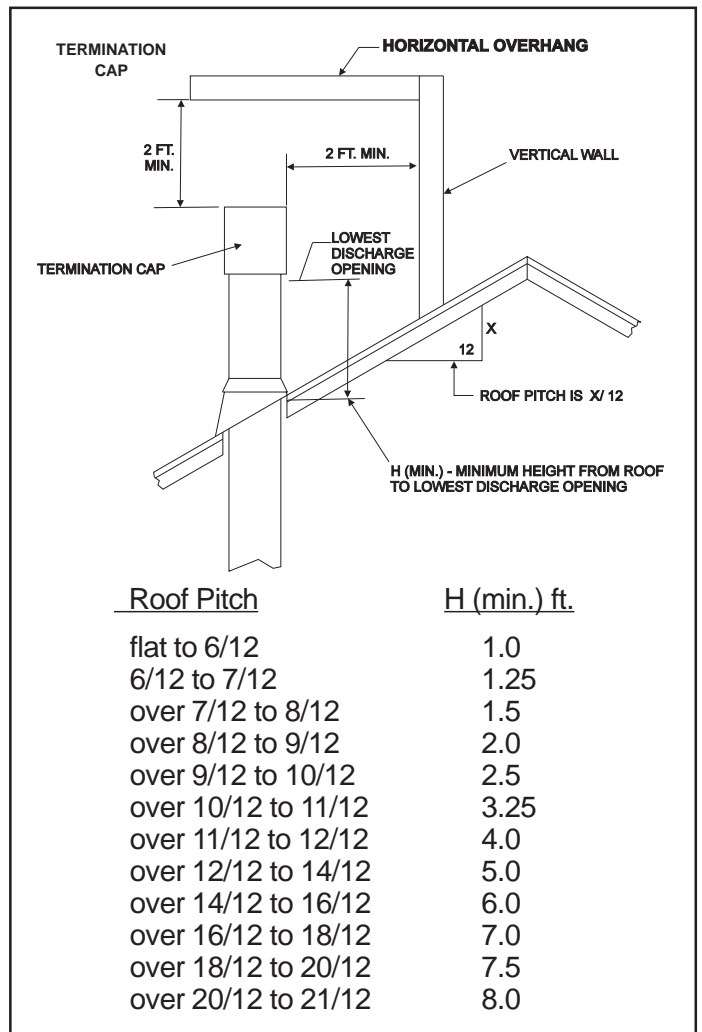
Minimum Height from Roof to Lowest Discharge Opening
